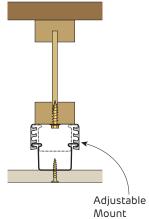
Adjustable MountWith 7mm holes suitable for Hex head screws Perspective and Sections
